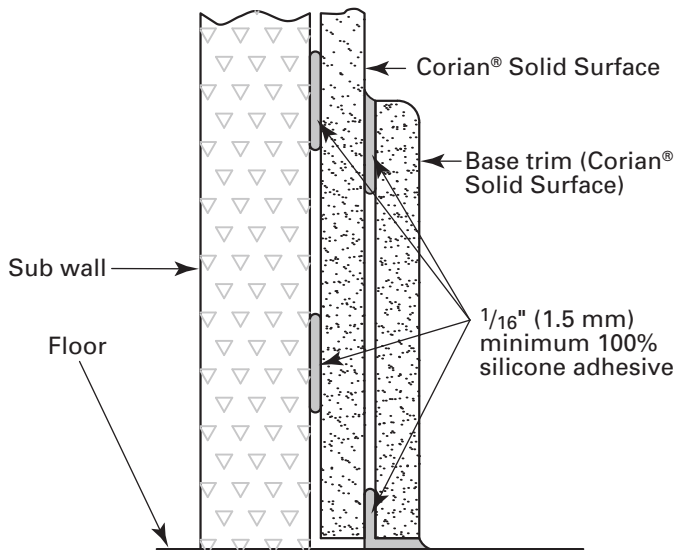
WALL BASE DETAIL WITH FLASH COVE
